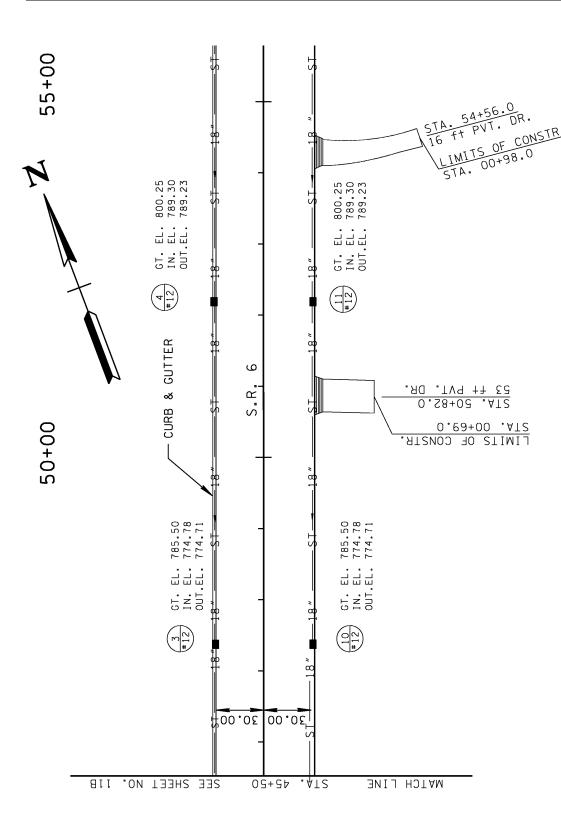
A-14. Portion of Proposed Layout Sheet (Storm Sewer Plan)
